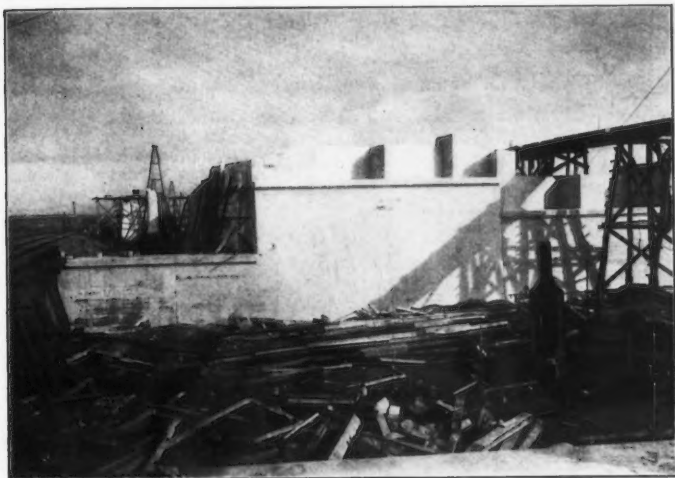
GOSMAN AVE. BRIDGE: MASONRY UNDER CONSTRUCTION.
